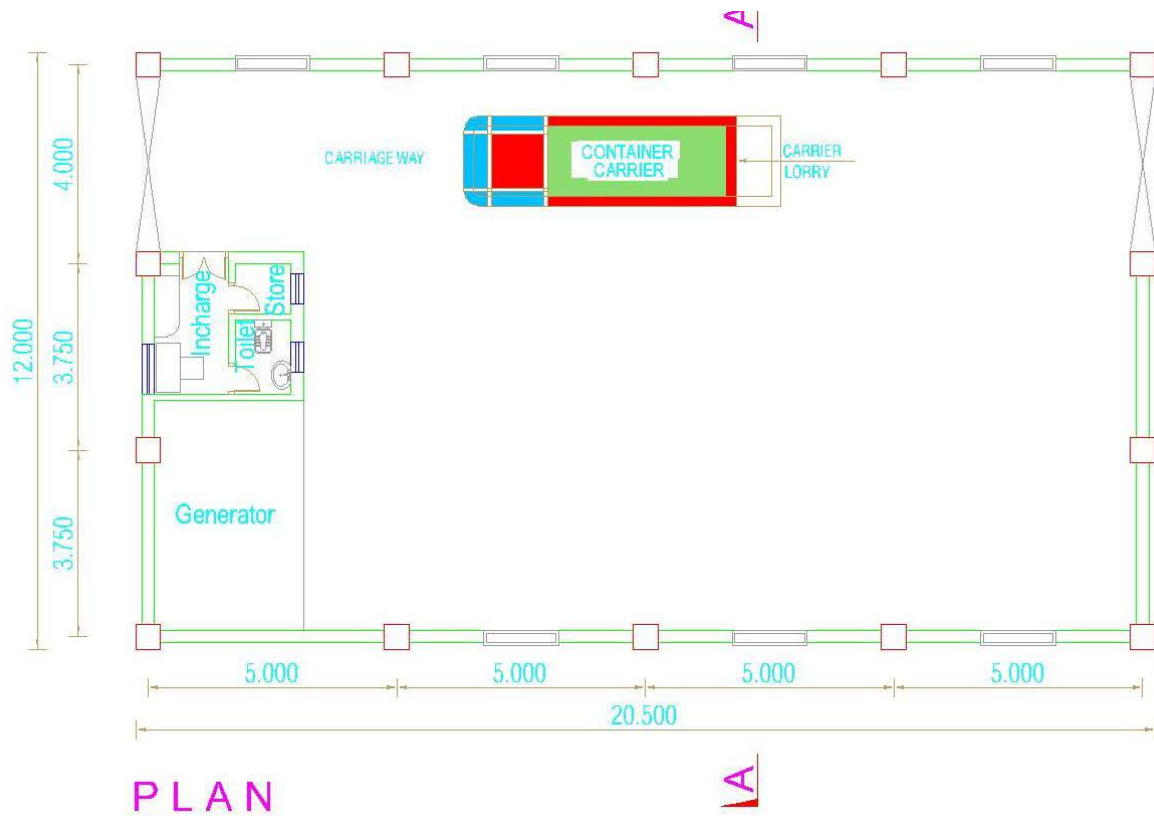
STS – 11 DT Road Nishkriti Preliminary Plan
